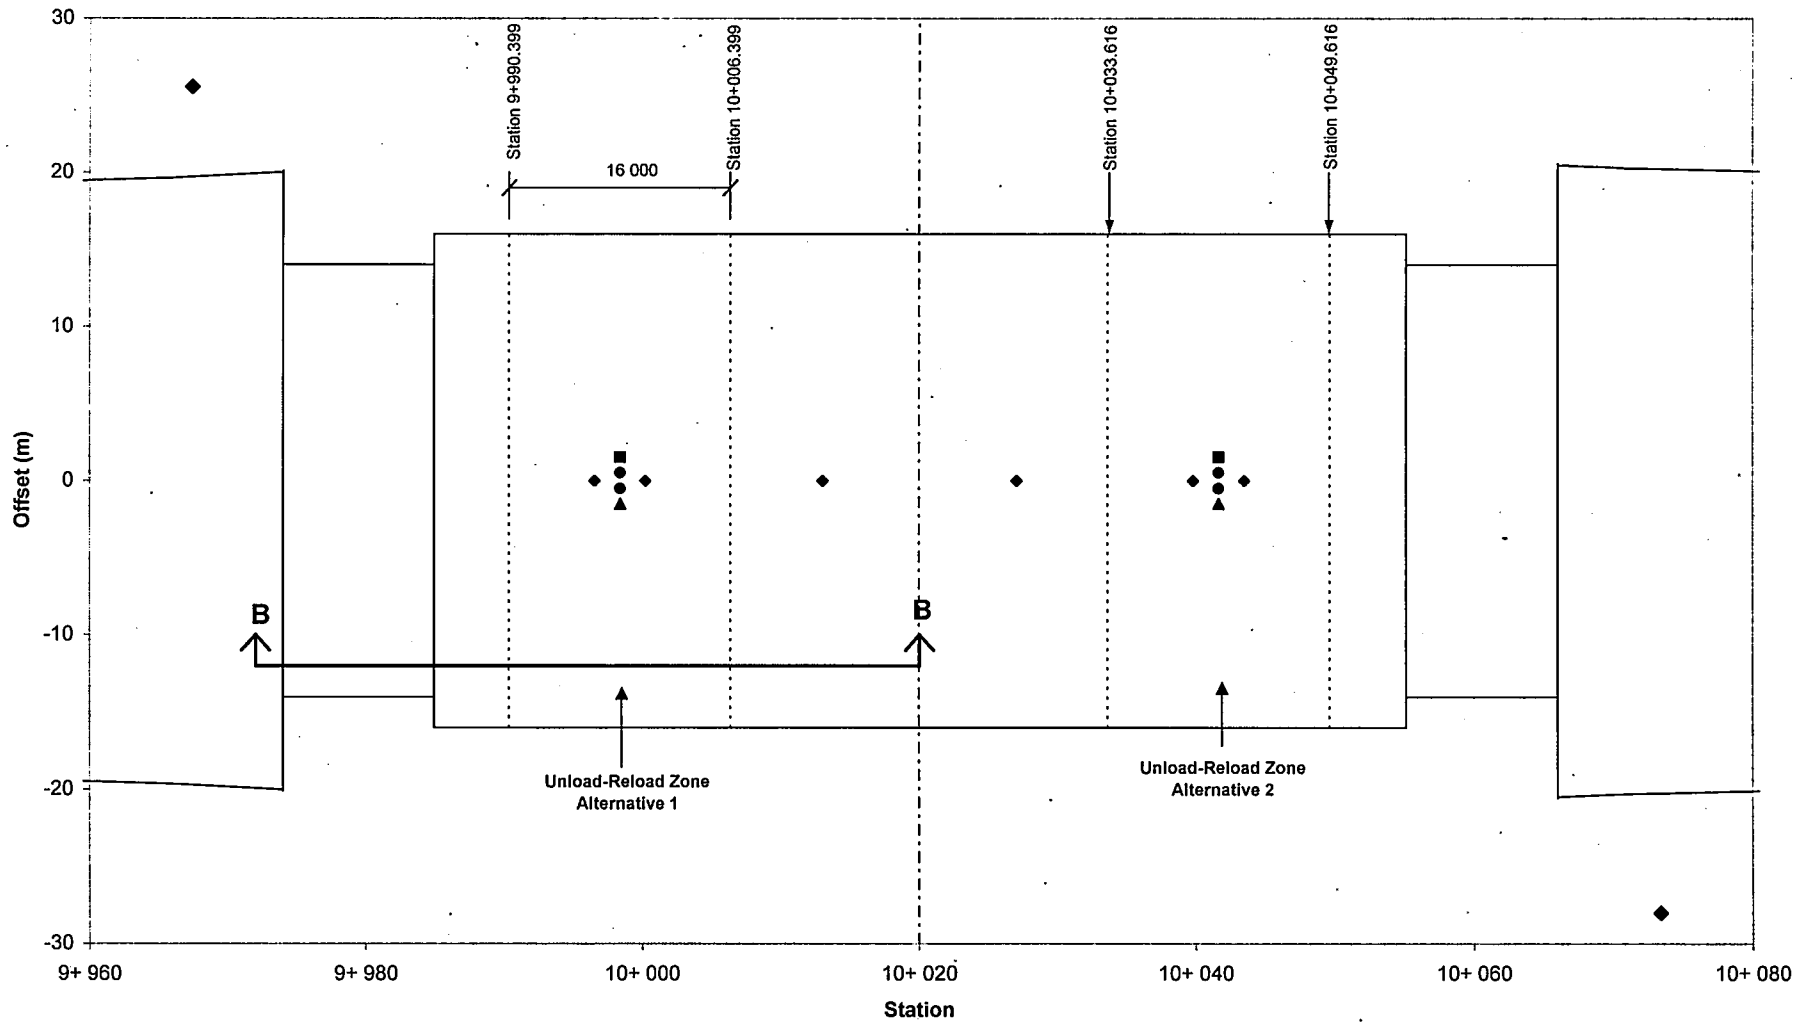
Layout of Stage 2 Unloading-Reloading, Falsework Foundation, Regional Road 22
